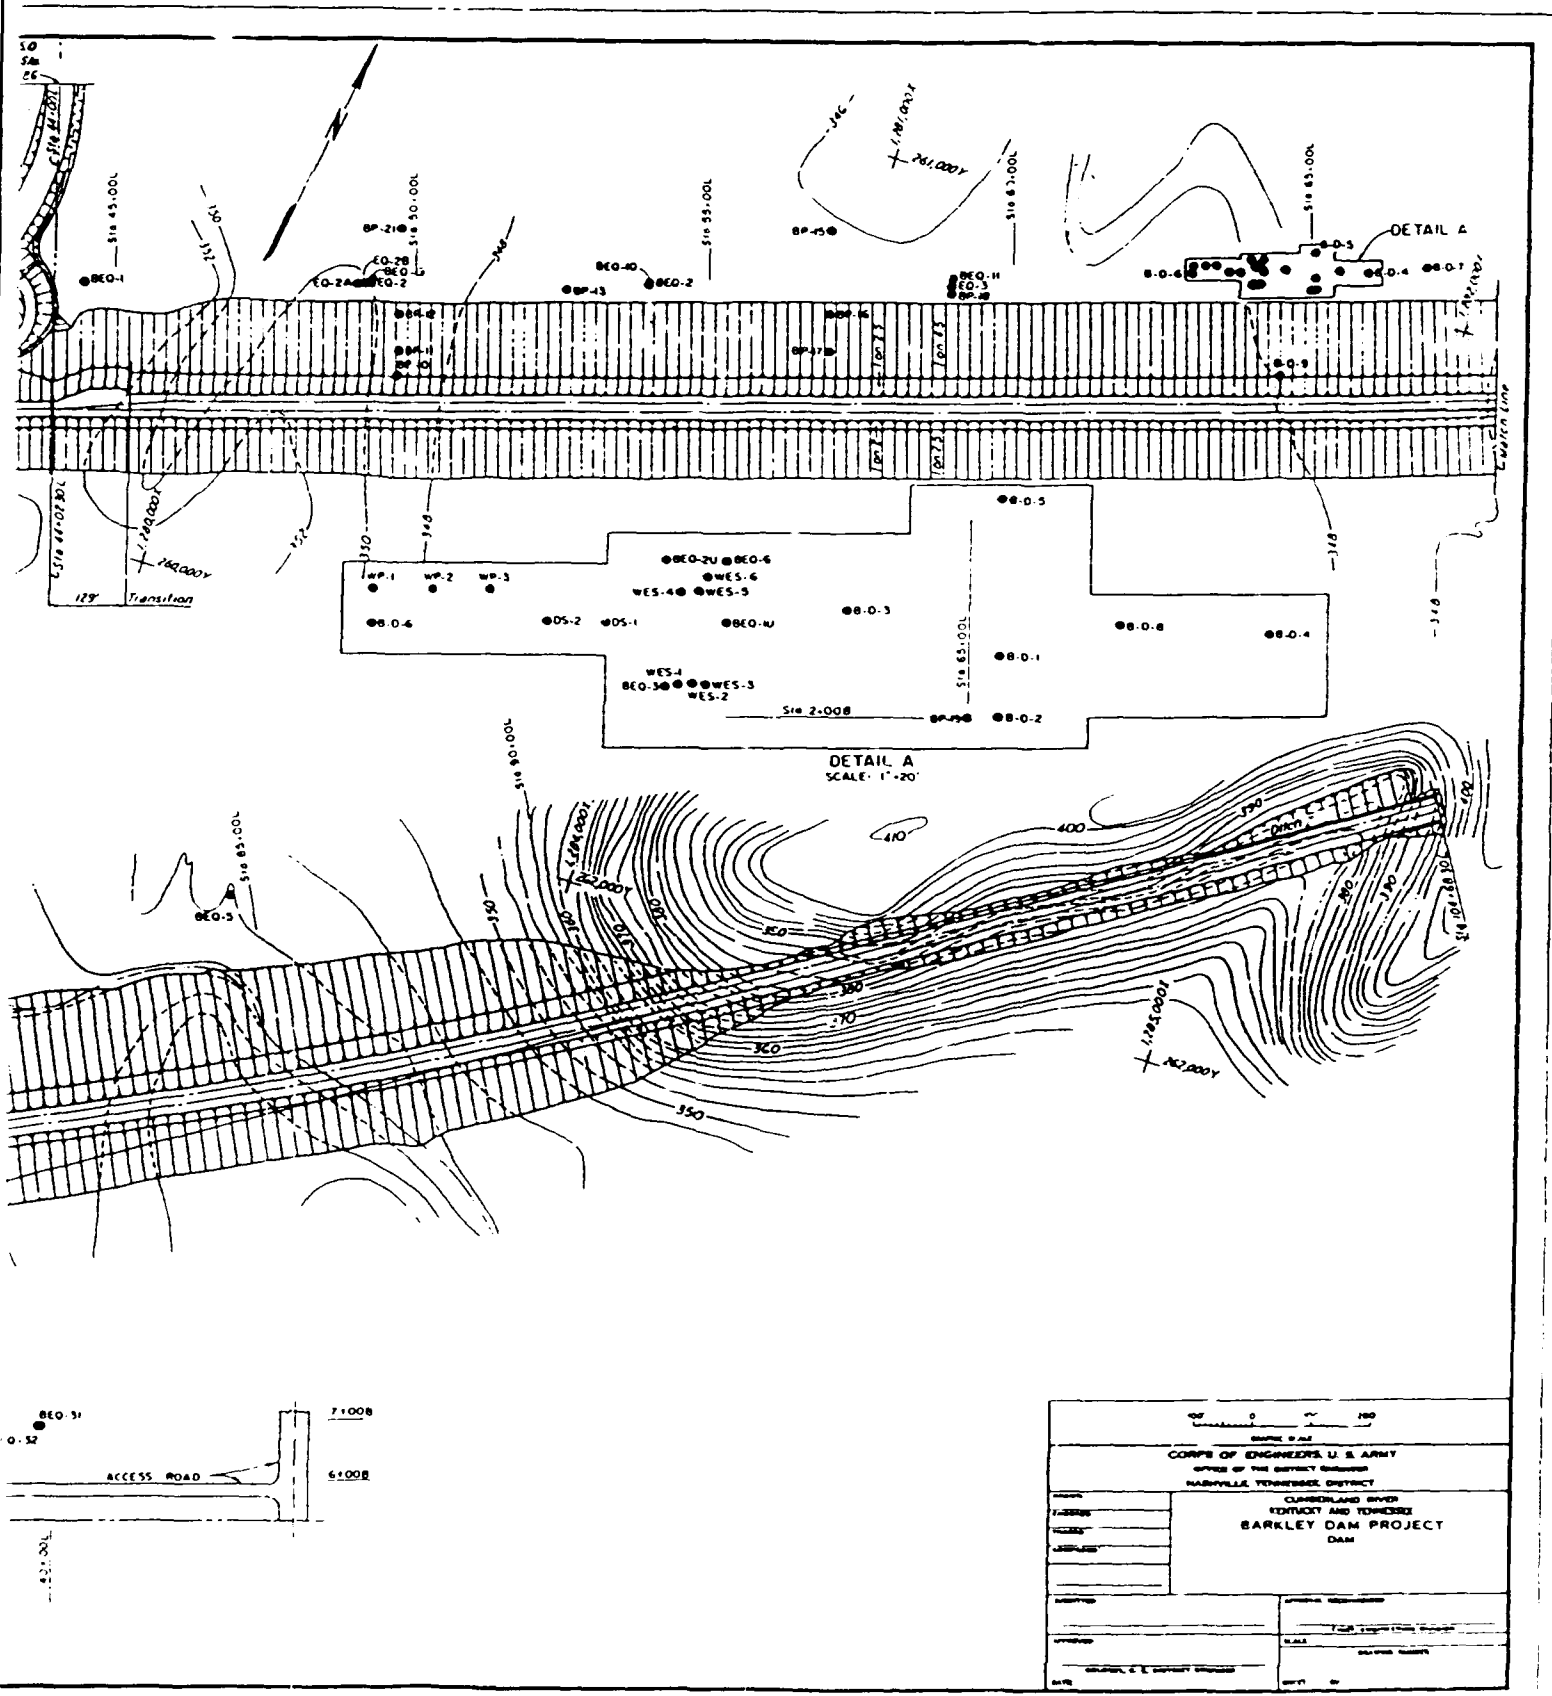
Plan view of Barkley Dam showing undisturbed borings and SPT
